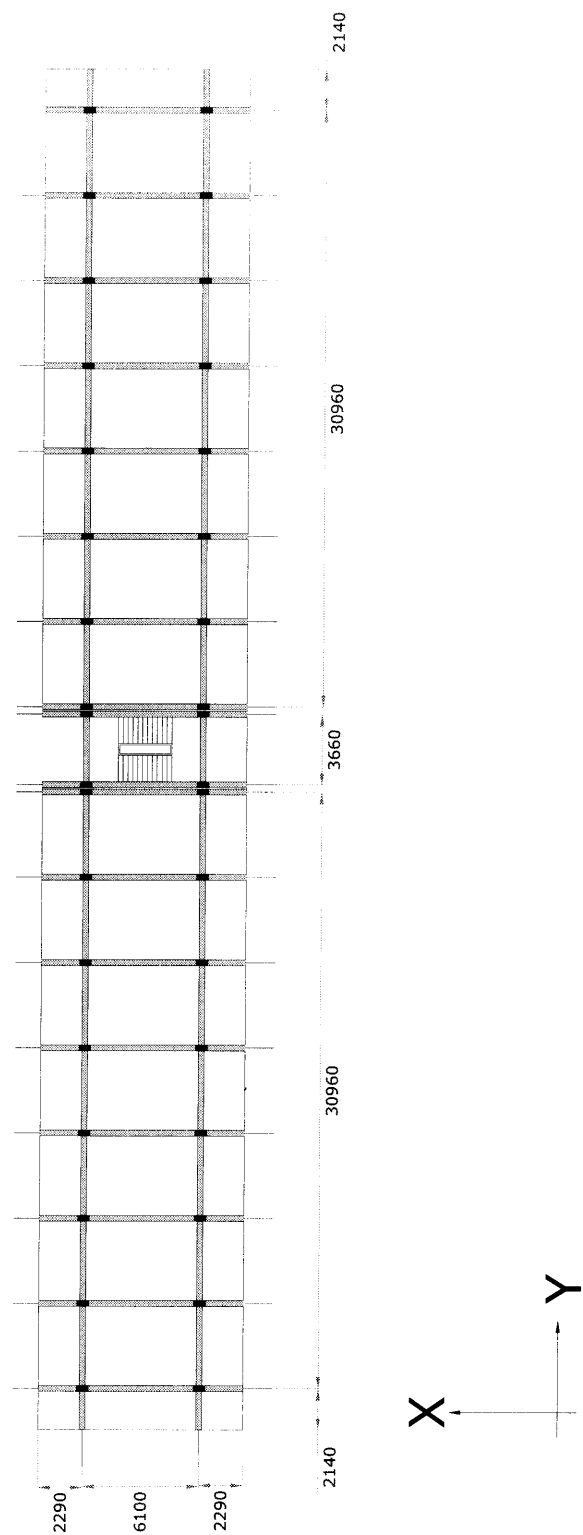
Titumir Hall Building Structural Element Layout (linear dimensions are in millimeter)
